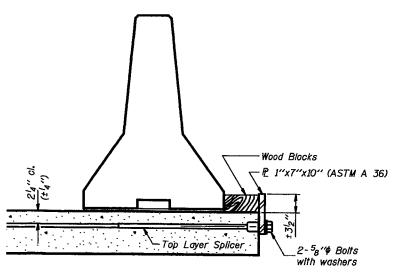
Detail I - With Bar Splicer or Couplers: Connect one (1) 1"x7"x10" steel 12 to the top layer of couplers with 2-58'4 bolts screwed to coupler at approximate & of each 10'-0'' barrier panel.
